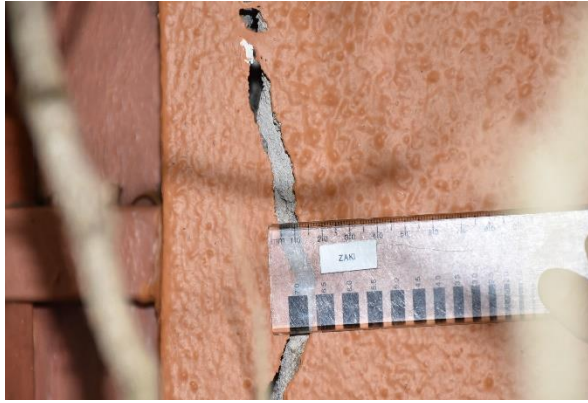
Wide crack on the wall using crack gauge
